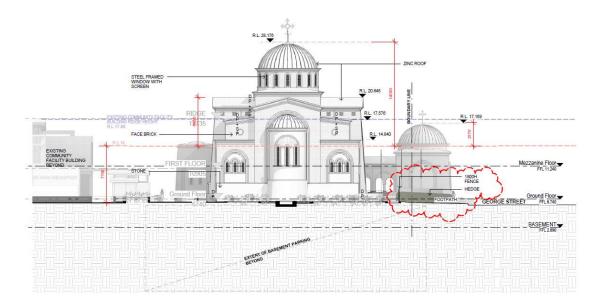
Extract of Northern Elevation (George Street) showing exceedance in building height. (Amended Plans)
